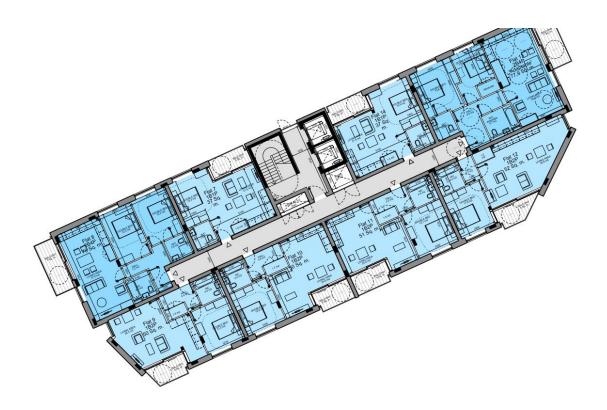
Proposed development scheme (floor 1-4 typical plan)
